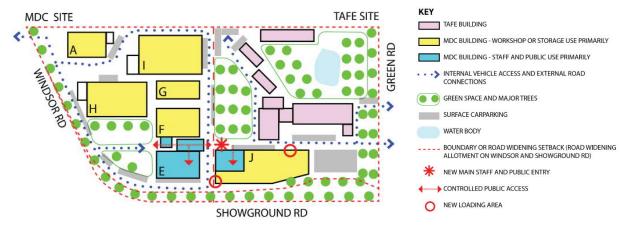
Option B site layout (preferred option) (Source: Lahznimmo Architects)
